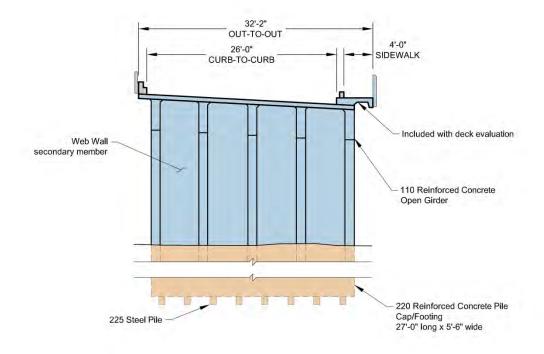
EI.24.4- 3: Cross section of superstructure near centerline pier
